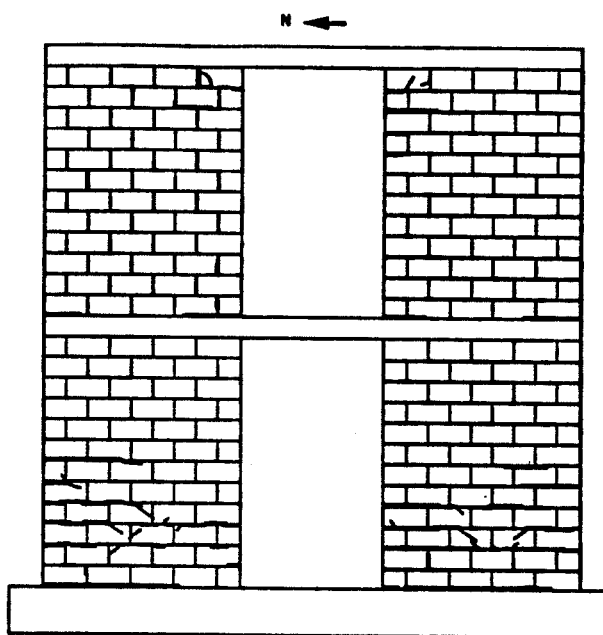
Sp. 2a: Progression of Wall Cracking at Load Point 284
